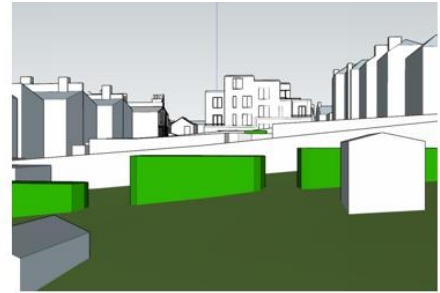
(above): CGI of proposal looking south down Gondar Gardens
